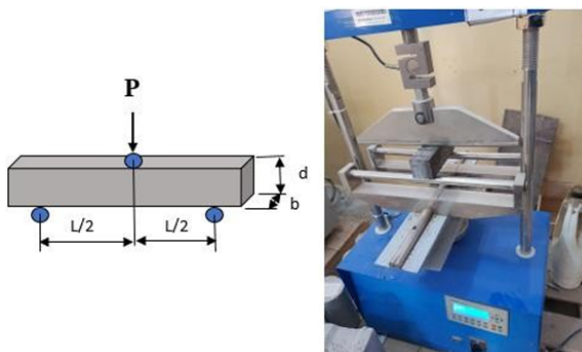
Shows the prism specimen during the flexural test by the universal testing machine.
